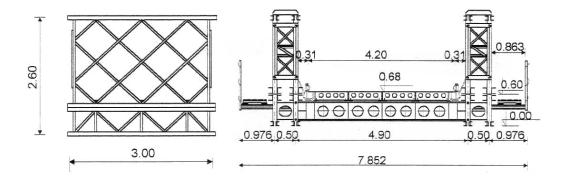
DMS-65 folding bridge: a) side view, b) span cross-section
